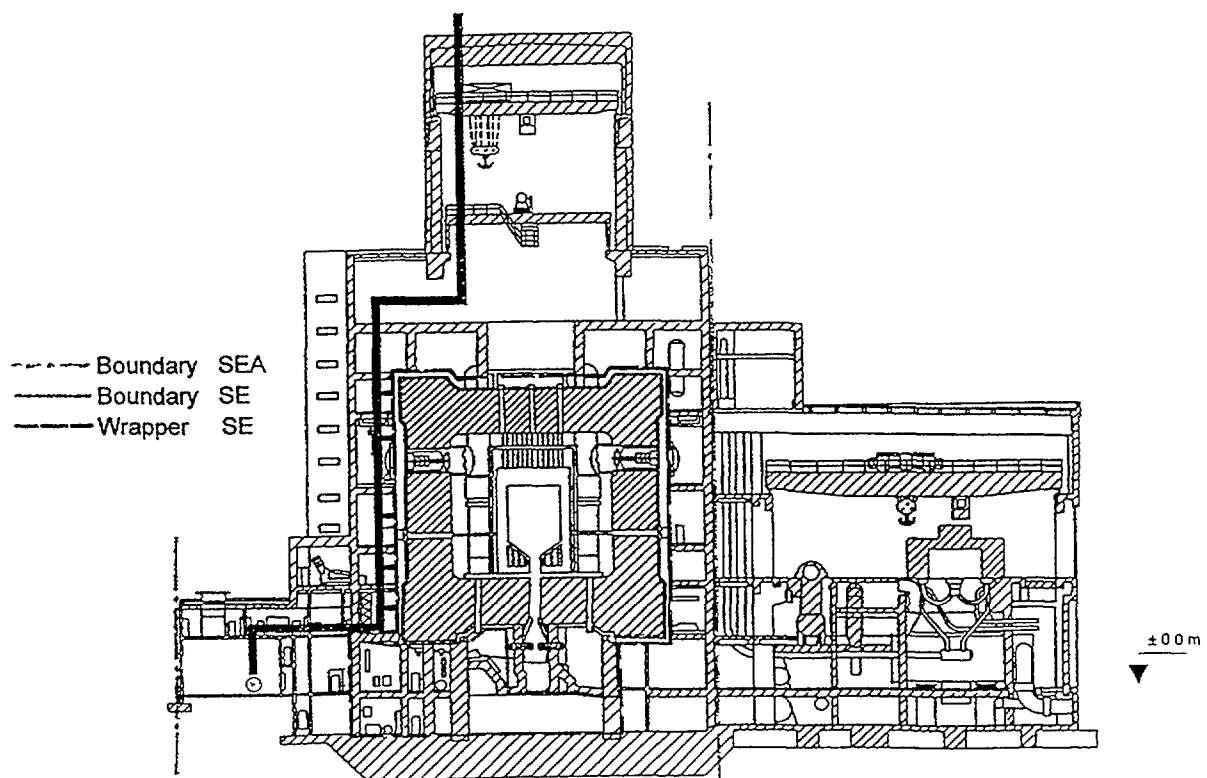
Safe enclosure concept (Reaktor building sectional drawing)
